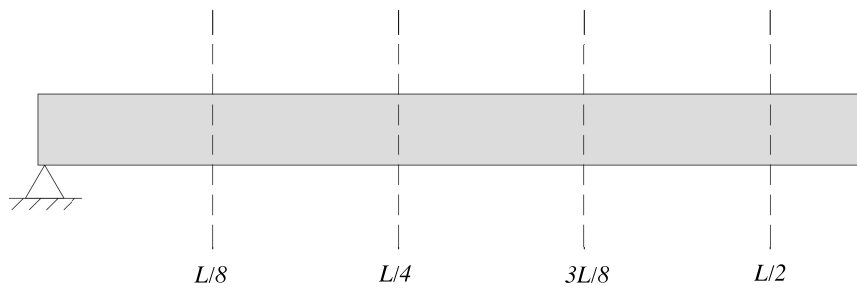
Assessment positions along the bridge, with example spacing of shear reinforcement.
